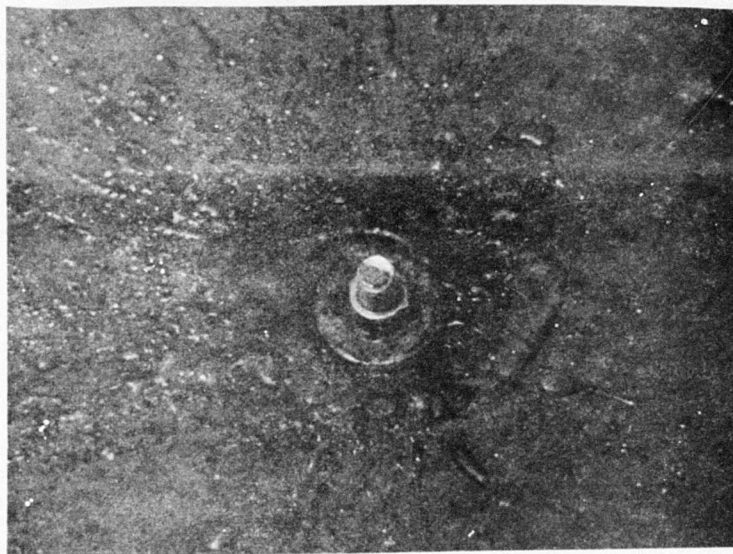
C. Test 1-2, Molten Lead-Sulphur Ramp Attachment Method With Close up of Bolt in Place, Showing Requirement for Grinding
